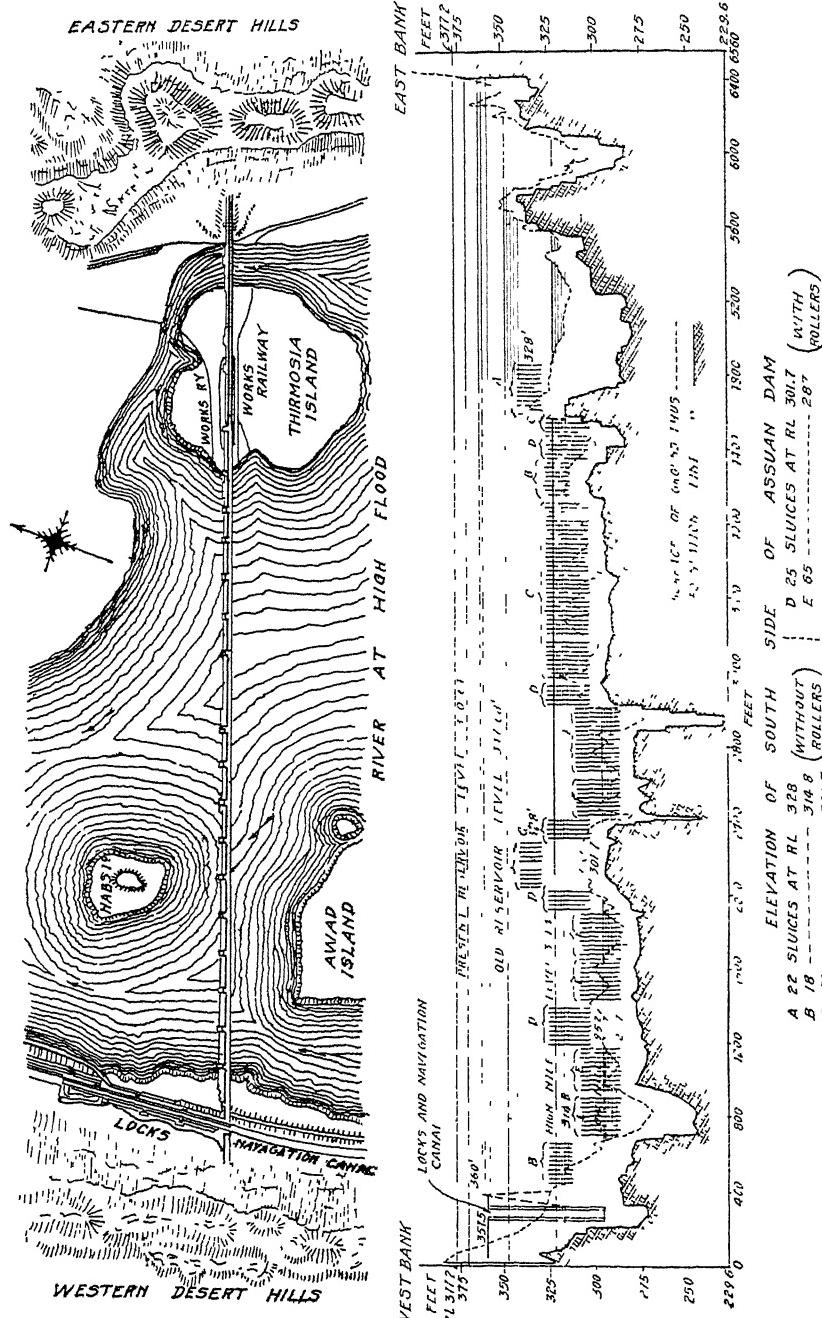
Location Plan and Longitudinal Section of Aswan Dam
